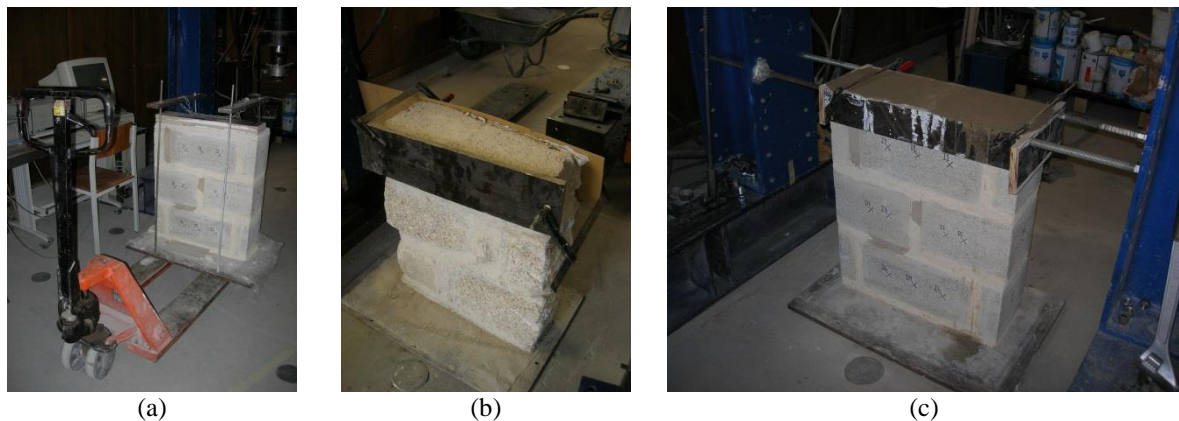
Masonry wallet preparation for testing: (a) transporting the specimen to the reaction frame; (b) positioning of formwork; and (c) application of thin mortar paste to the top of the specimen
